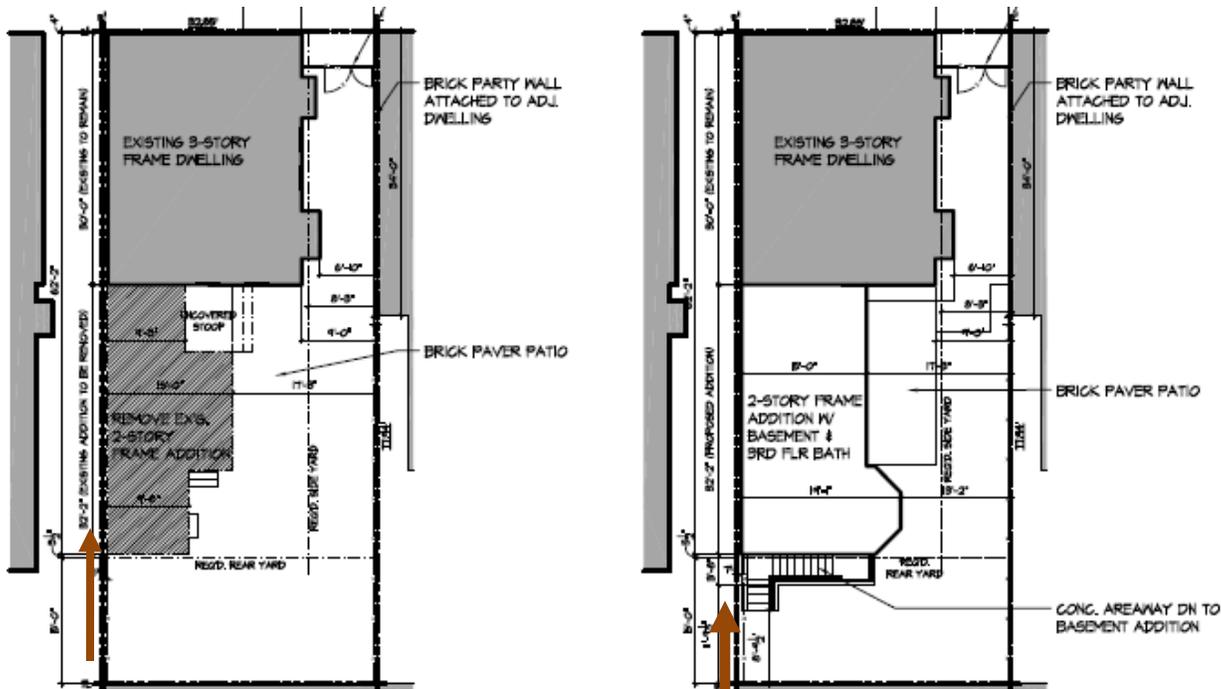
Existing (L) and Proposed (R) Main House and Addition. Note existing and proposed 7-inch side yard on left.
